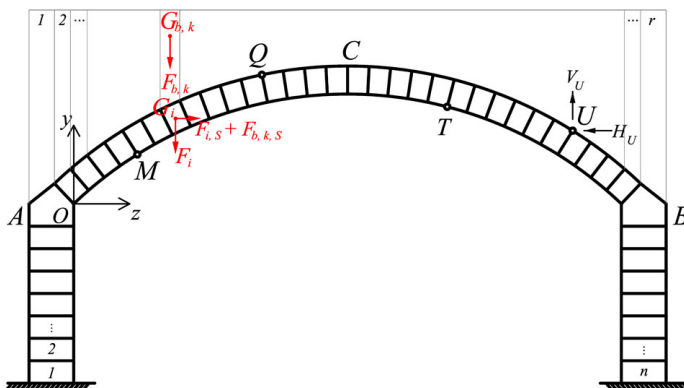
Weight of the voussoirs and backfill and inertial forces acting on the four-hinges arch.
